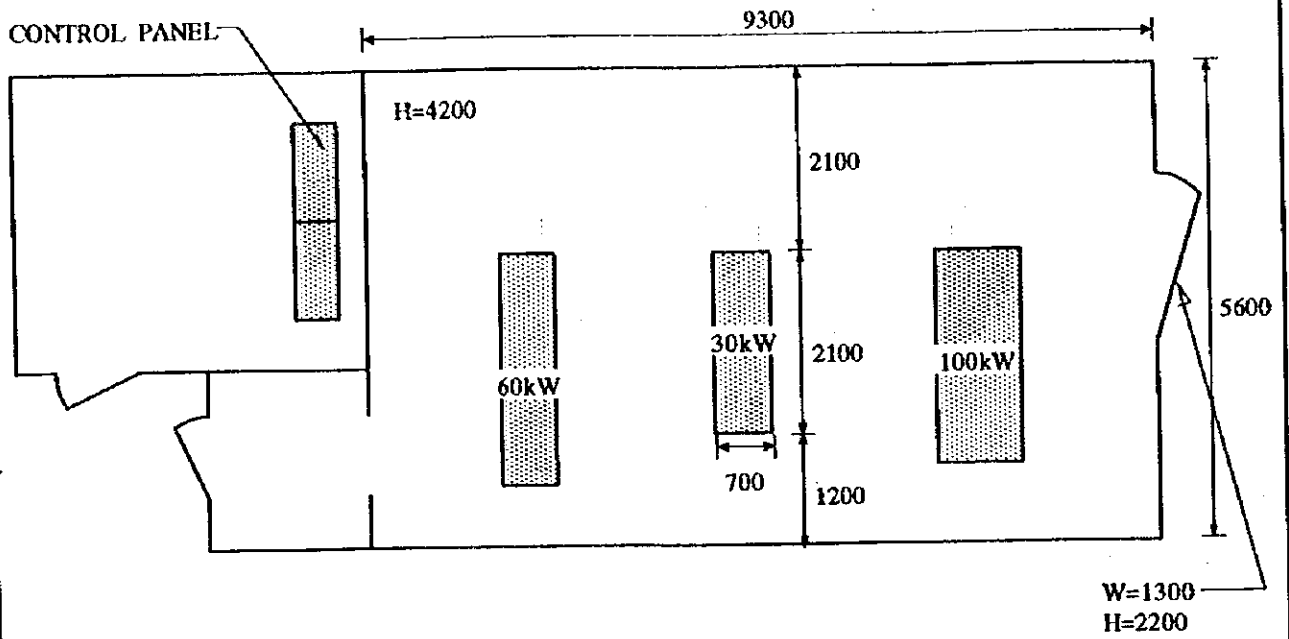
27 Layout Drawing of Erdenehairkhan
